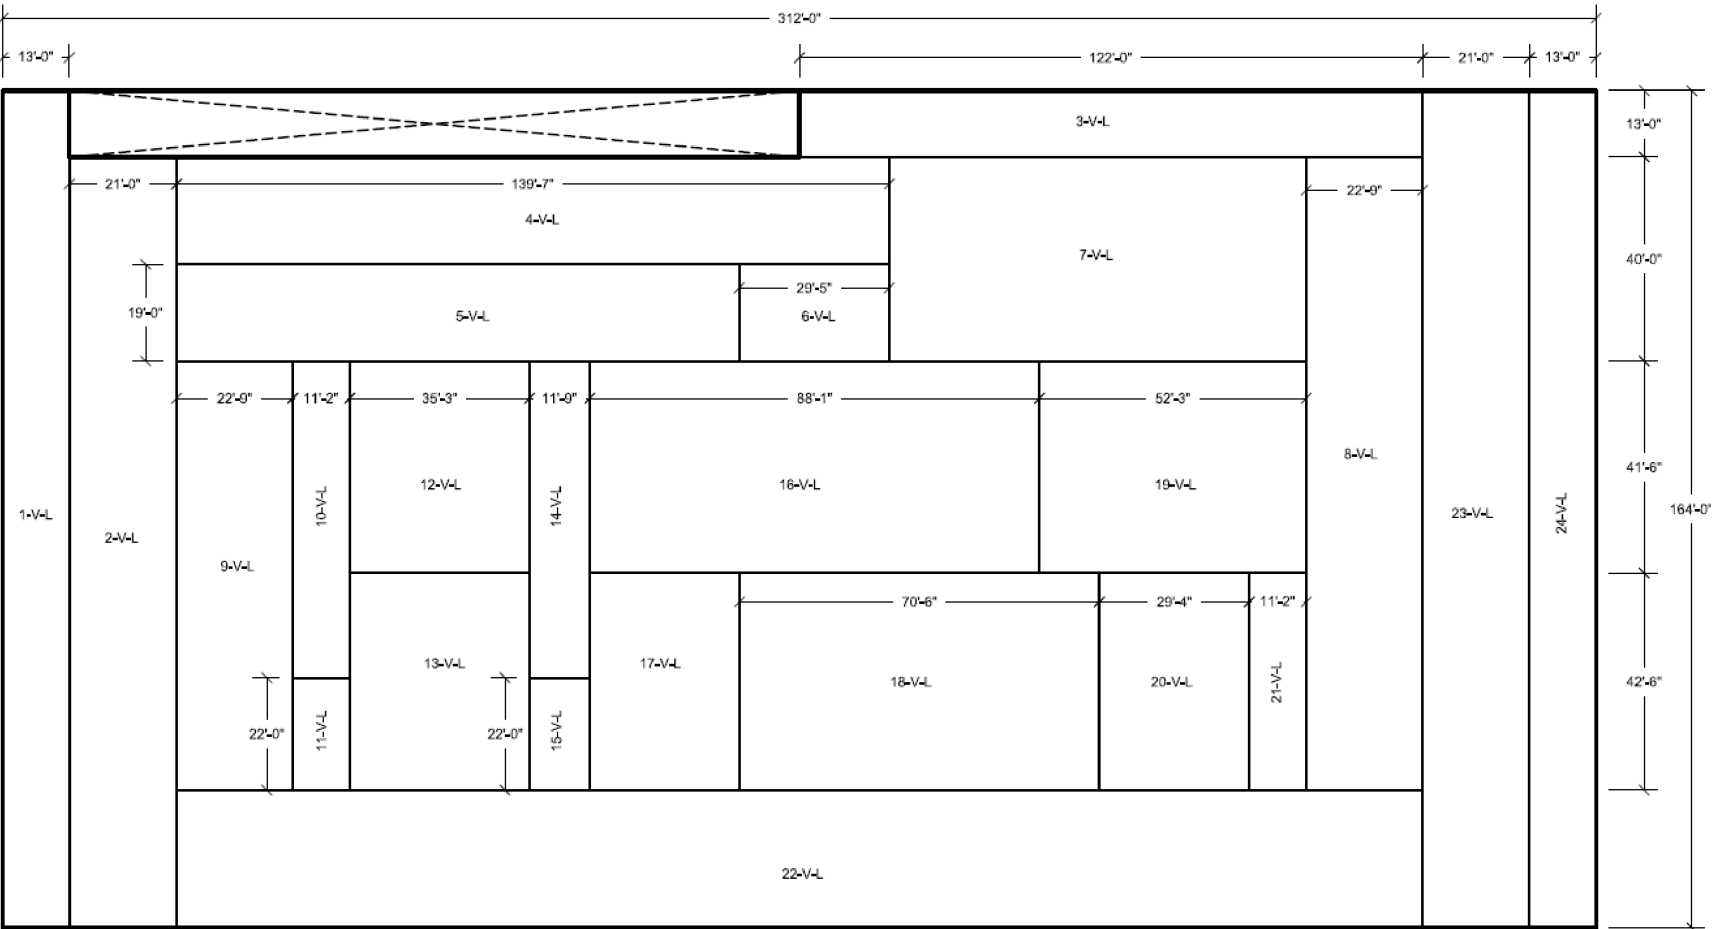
H.6-132 UHS Basin Foundation Mat North/South Reinforcement Zones Top Face
